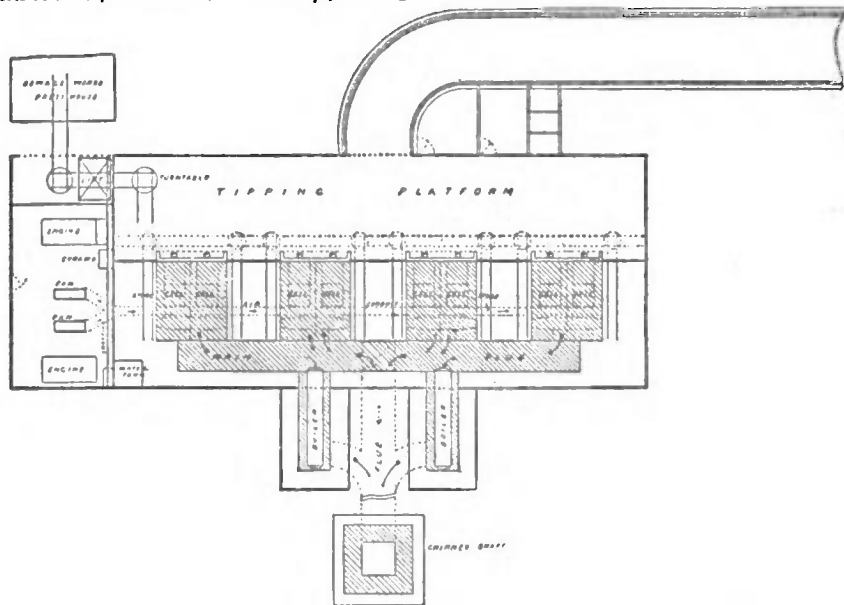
Leyton Destructor. Block Plan, showing general arrangement of the Works.
